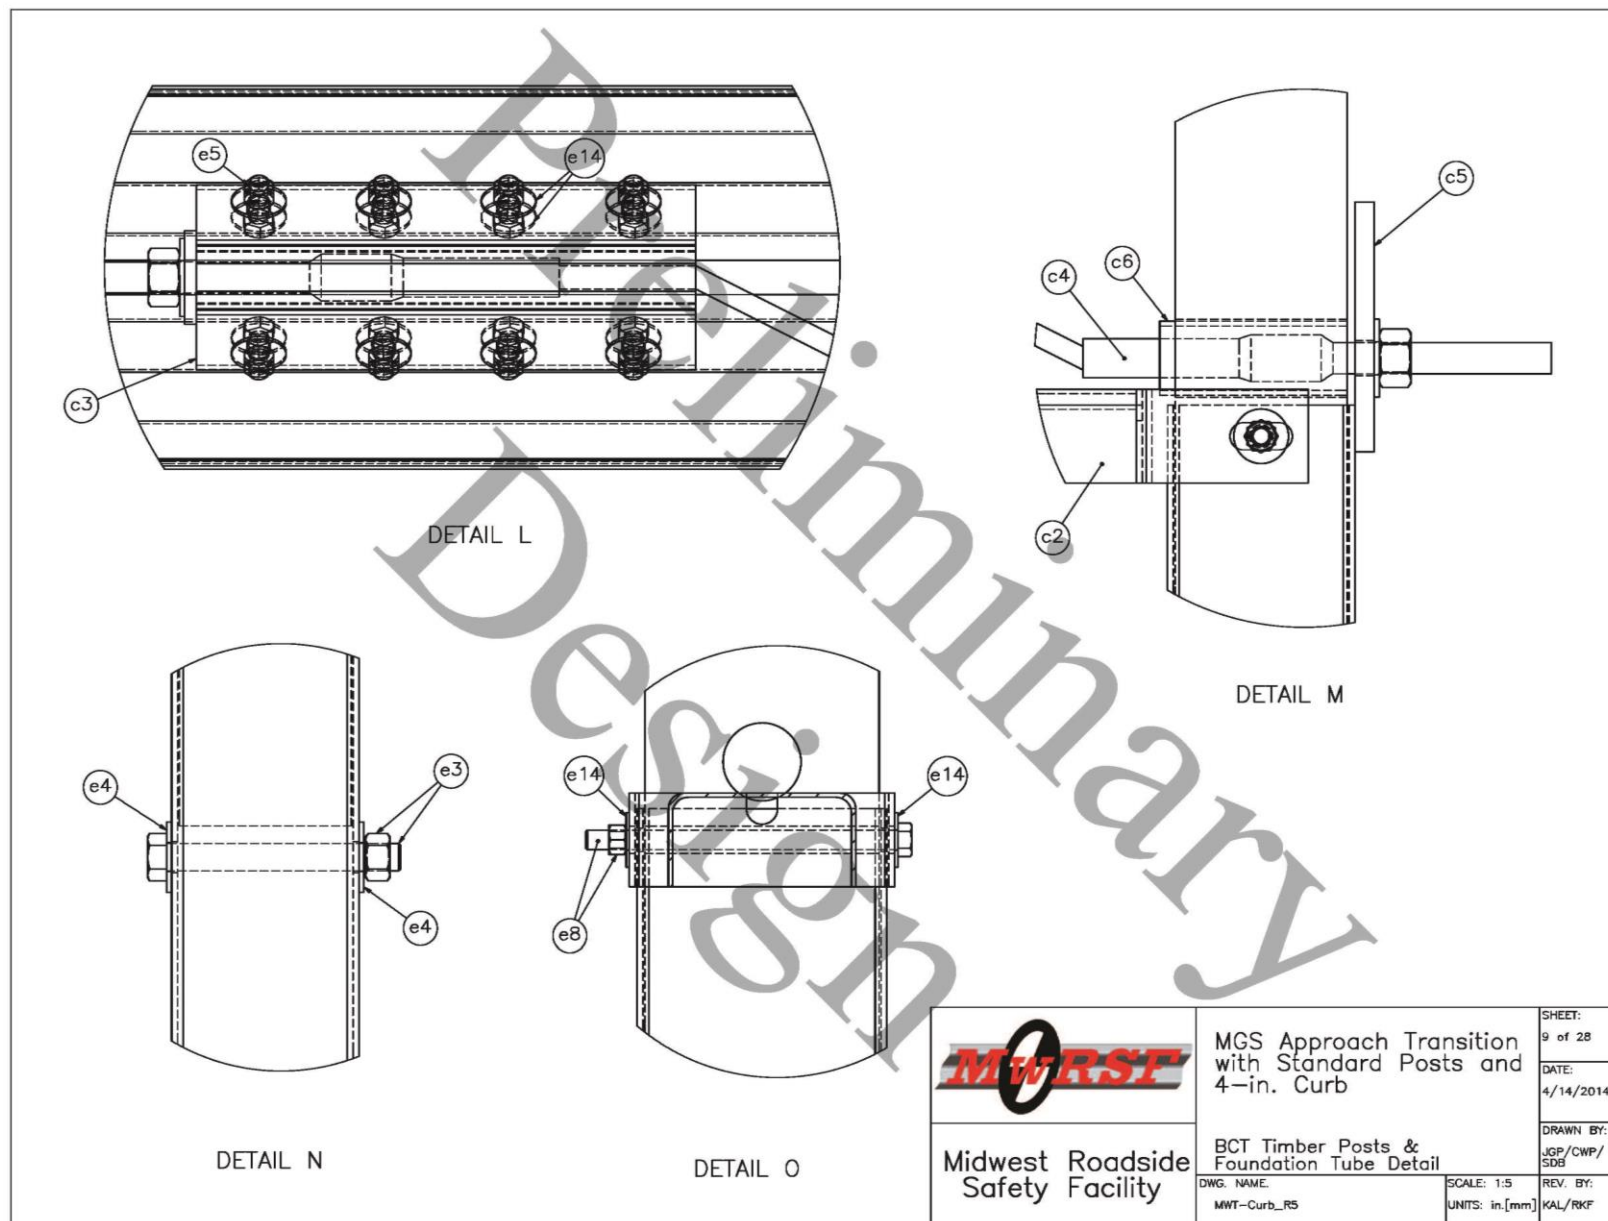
BCT Timber Posts and Foundation Tube Detail, Test No. MWTC-1
